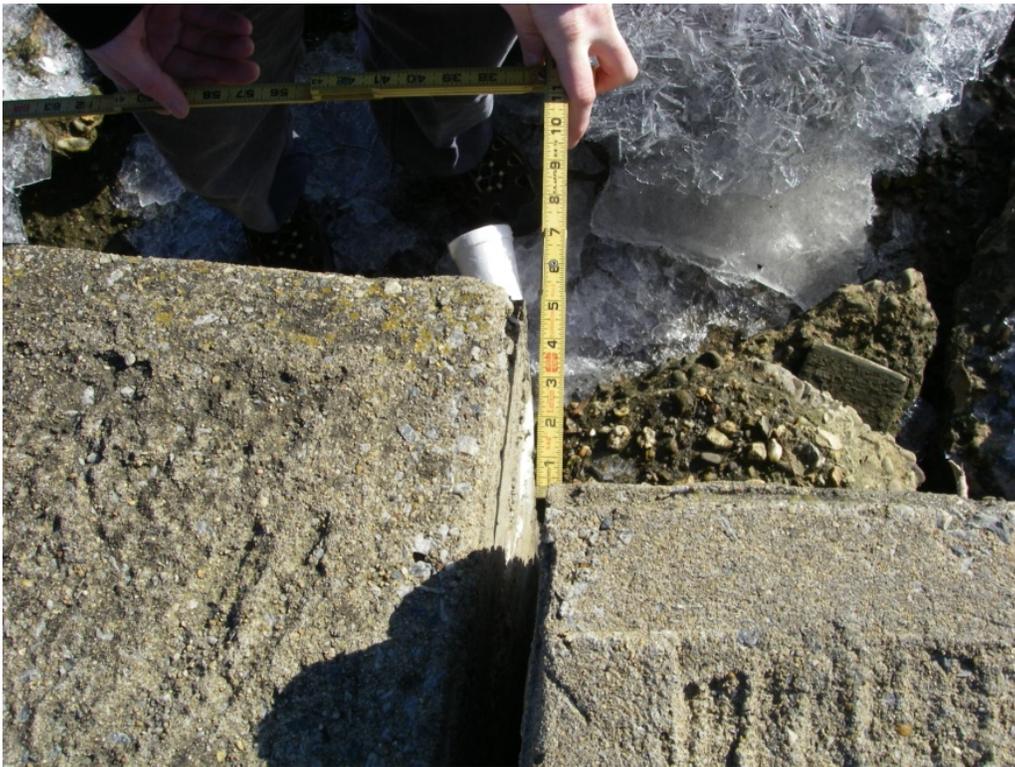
5.5 inch horizontal displacement between Slabs 1 and 2
